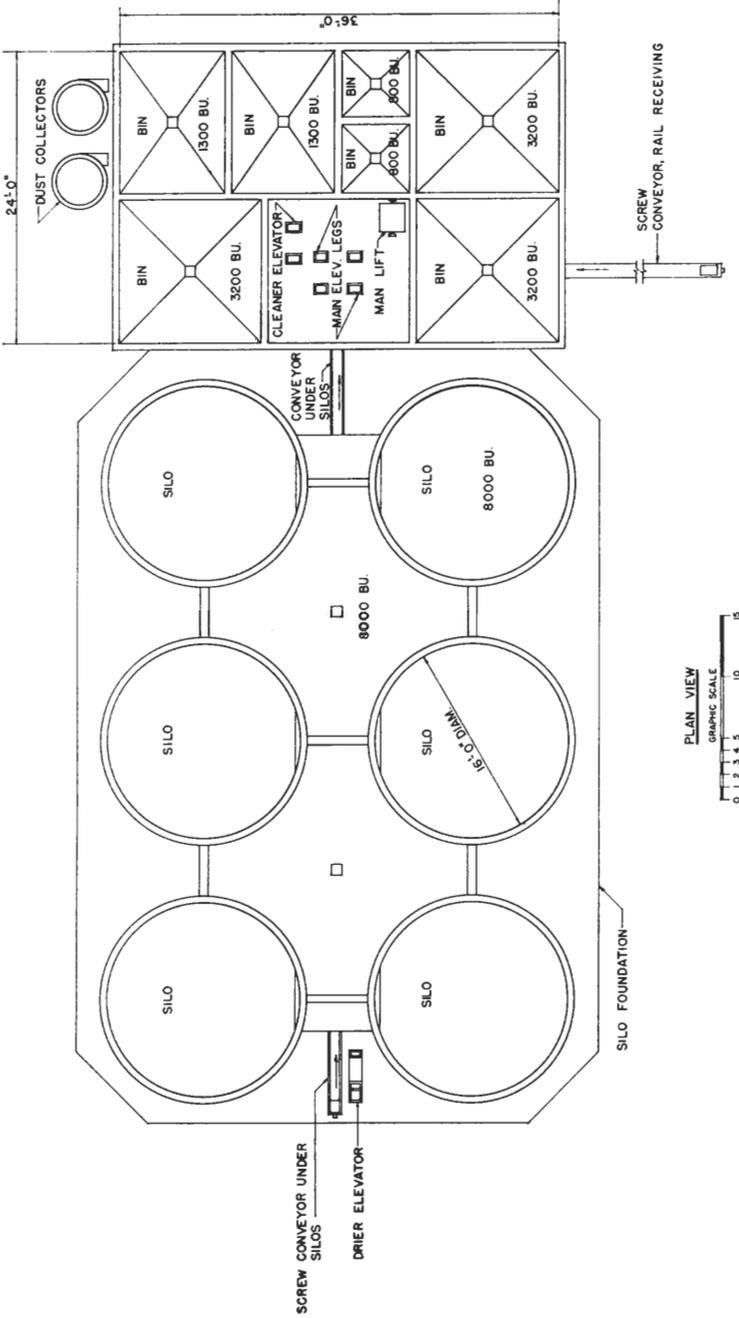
SCHEMATIC PLAN OF ELEVATOR SHOWN IN FIG. 6.
